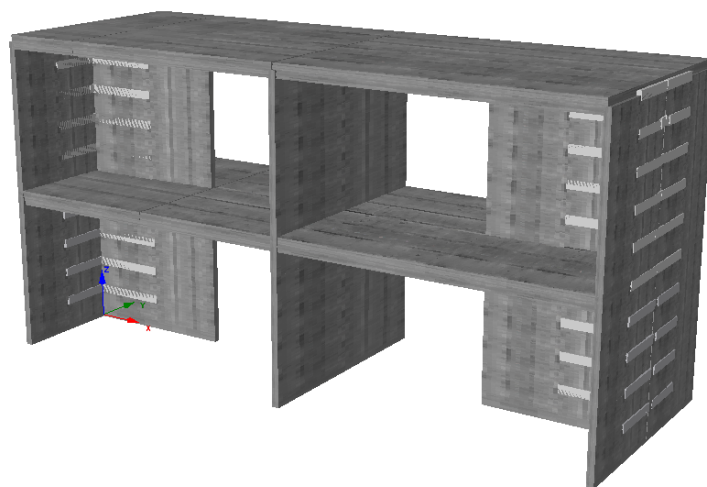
SeismoStruct model of the precast RC wall-slab building
